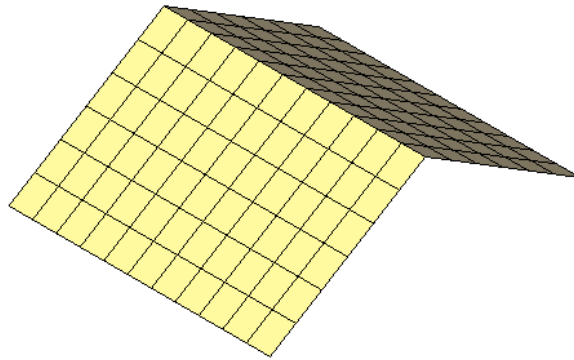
MODELLING OF TIMBER ROOFS
